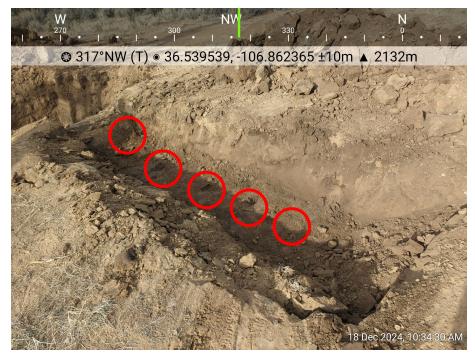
SS08 collected as a 5-point composite sample from new release excavation area.
